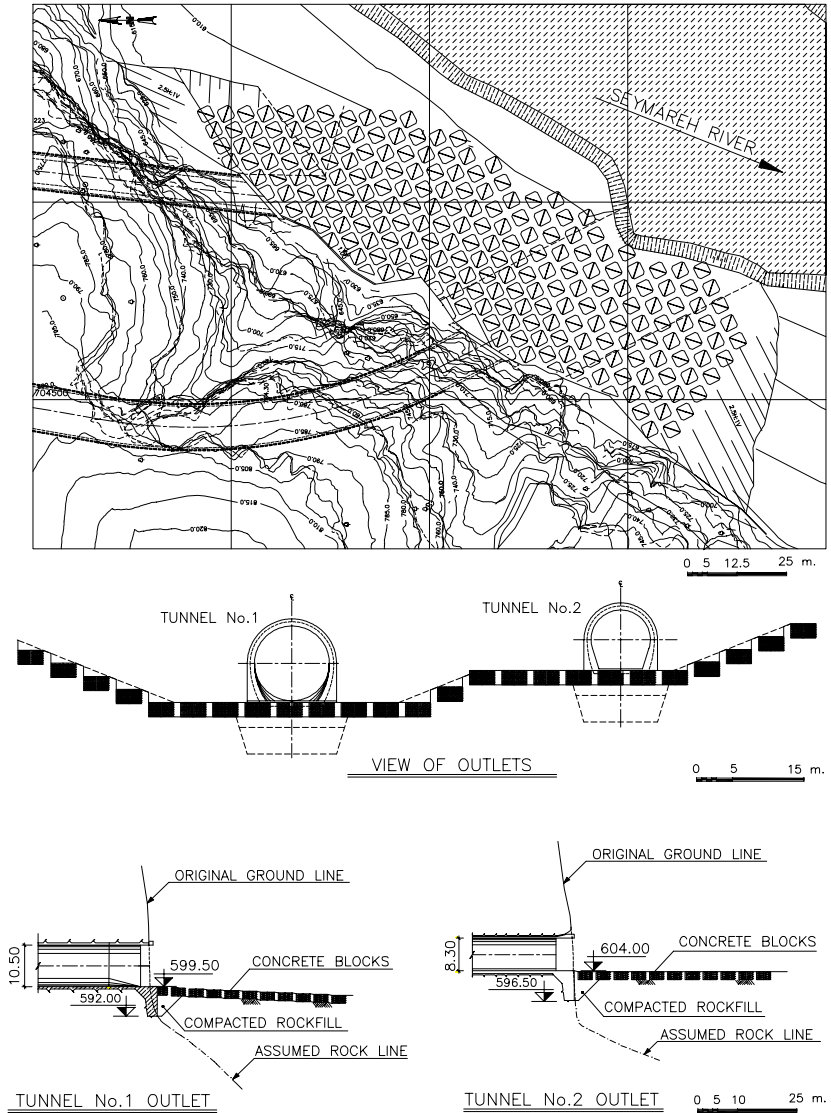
Plan and sections of tunnel outlets and downstream protected area
